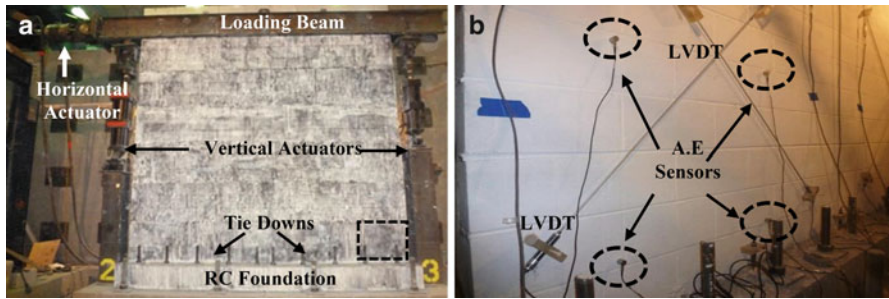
Experimental setup of the tested masonry wall; (a) front view with coating for DIC measurements, (b) rear view showing the AE sensors and LVDTs for displacement measurements
